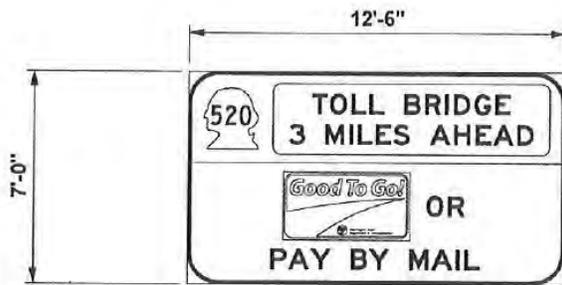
SR 520 Toll Warning 3 Miles Ahead Sign Detail. Dimensions Provided for Informational Purposes Only.
